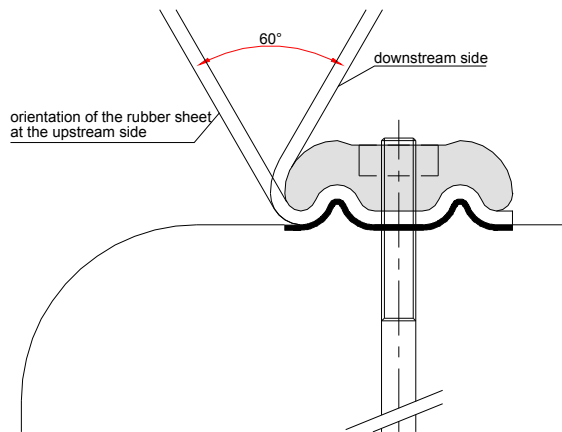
Applied clamp system to connect the rubber sheet to the foundation
